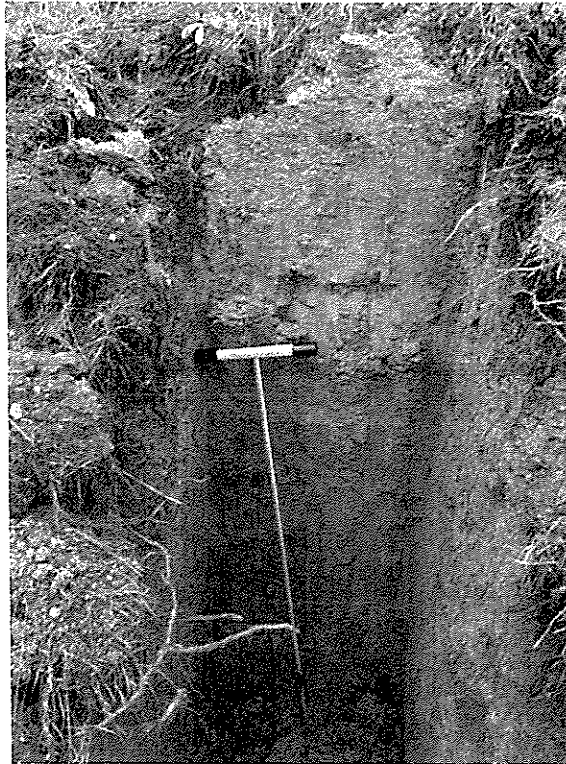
View the clayey silt soils encountered at shallow depth in Test Pit-1.
